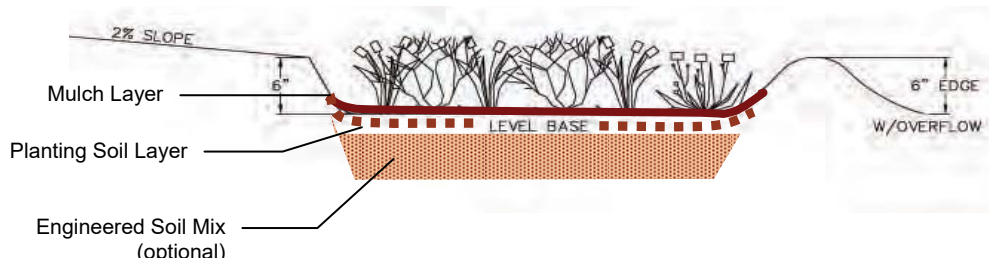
Rain Garden Layout for Parking Lot Runoff
